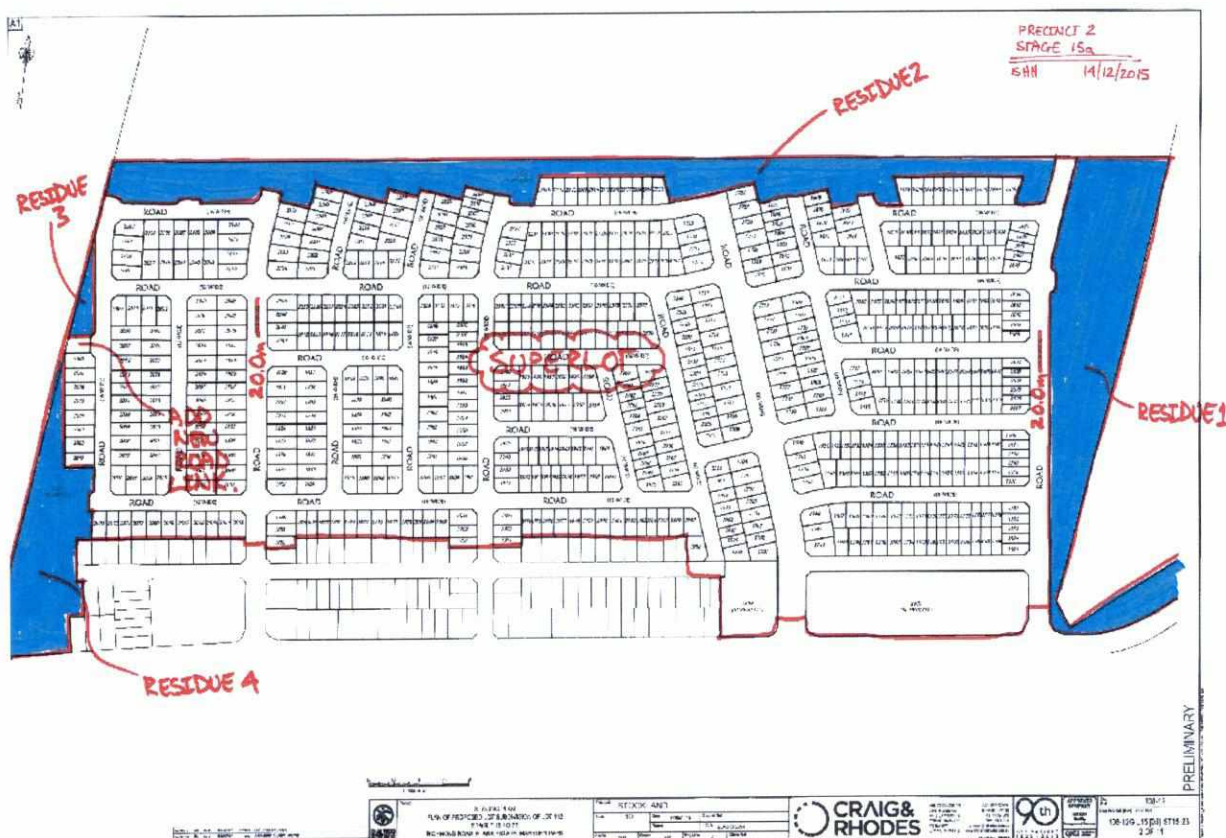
Amended Staging Plan to create Stage 15A Superlot for Subdivision and New Western Road Link (Source: Cardno)
